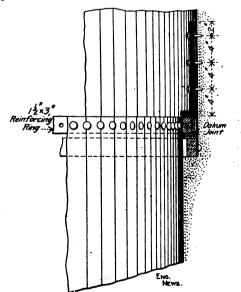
Method of Connecting Adjoining Sections of Casing in Sinking a Well Through Water-Bearing Sand and Clay, at Alton, III.
